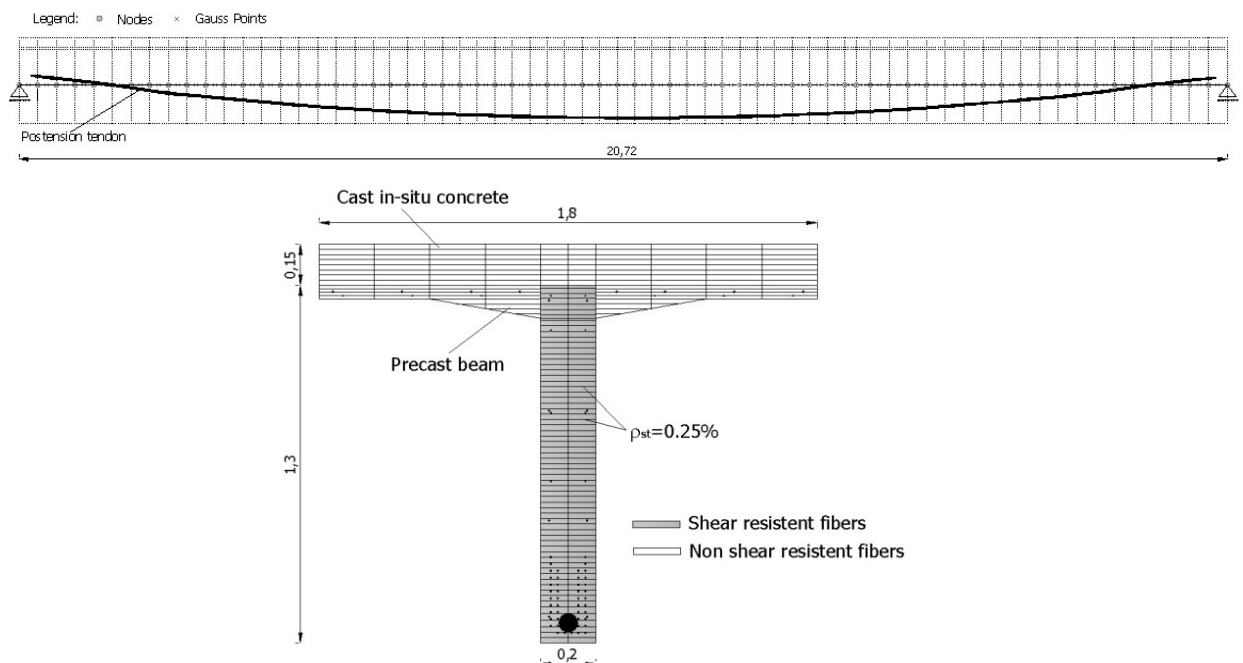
Model of the beams of the Wassnerwald bridge
